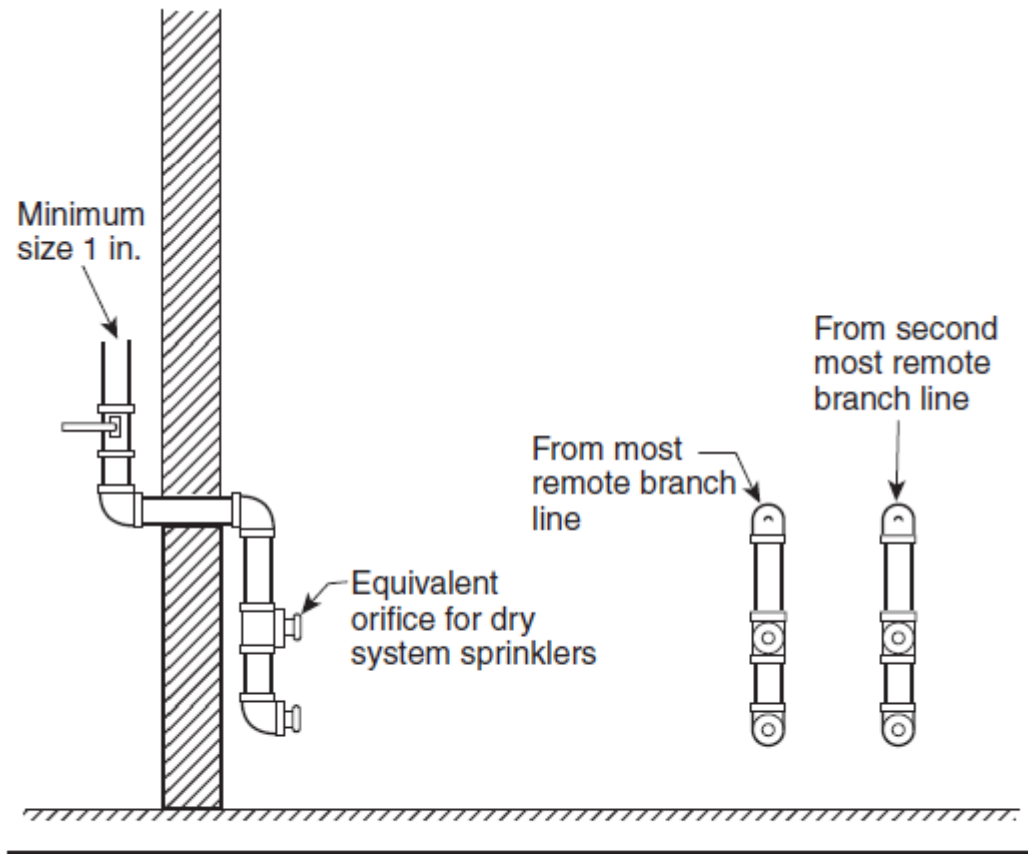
Example Manifold Arrangement (Four Sprinklers).
